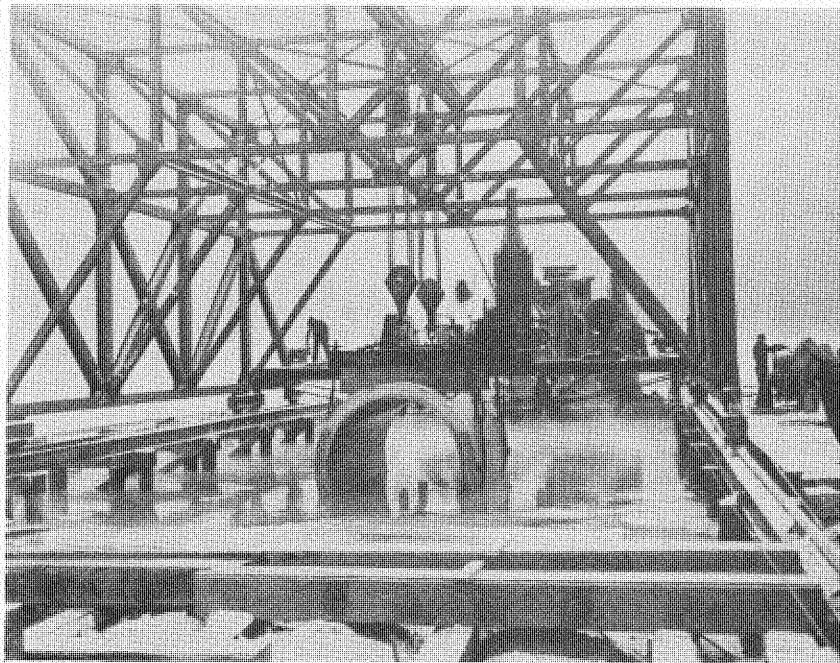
Launching gantry crane lowering precast pipe to lake bottom. Placing gantry barge in rear is ready to move in and pick up section of pipe from lake bottom. P783-908-1183, December 2, 1952.
